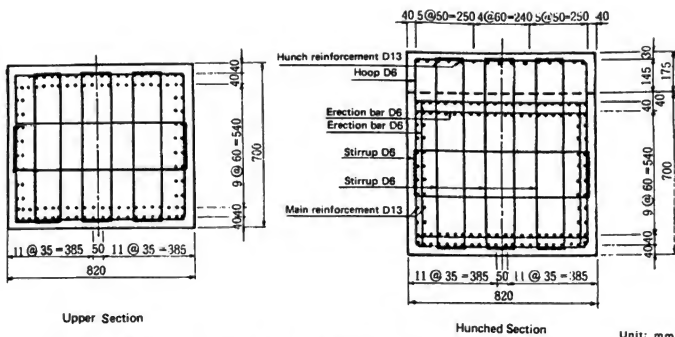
Section of the Columns of No. 1 (One-directional Loading) and No. 3 (Basic) Models
